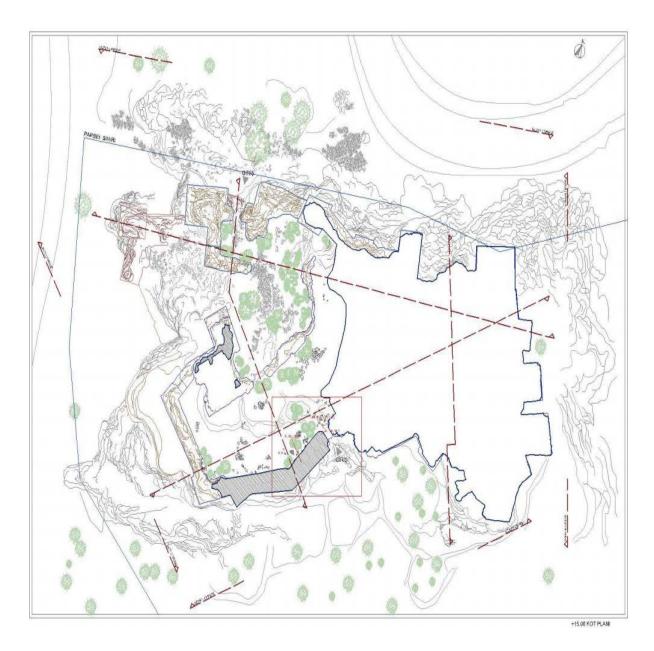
Upper Floor So + 15,00 In The Plan View Of Specimen Places Taken
